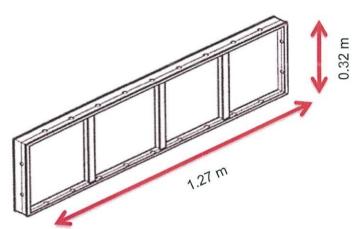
Beam Side Panel Source: architectjaved.com (n.d)
